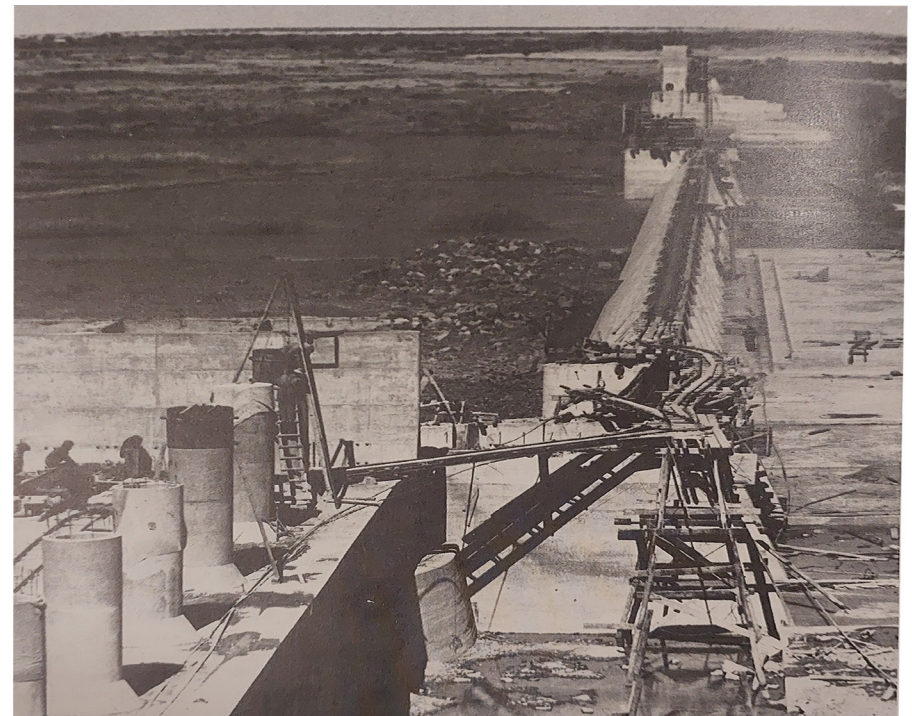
Construction of the Dam wall (Horn, 1926).
